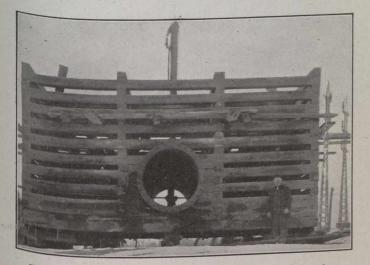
Timber Intake Crib Under Construction for Beach Pumping Station, Hamilton.
